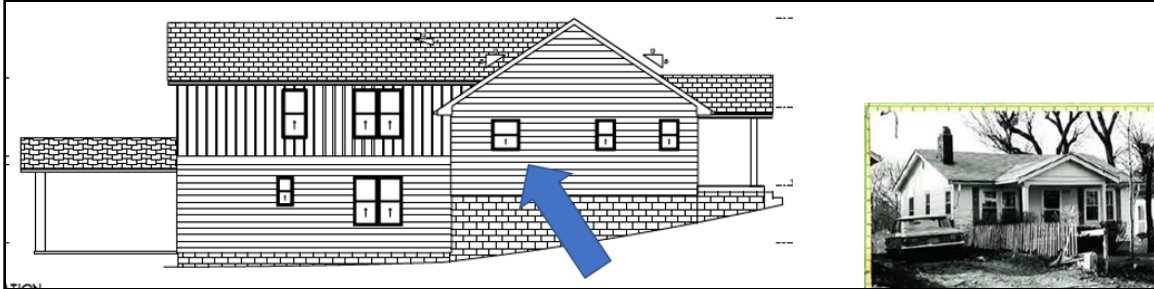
Left elevation. Arrow indicates window to be re-introduced, as seen in photo.
